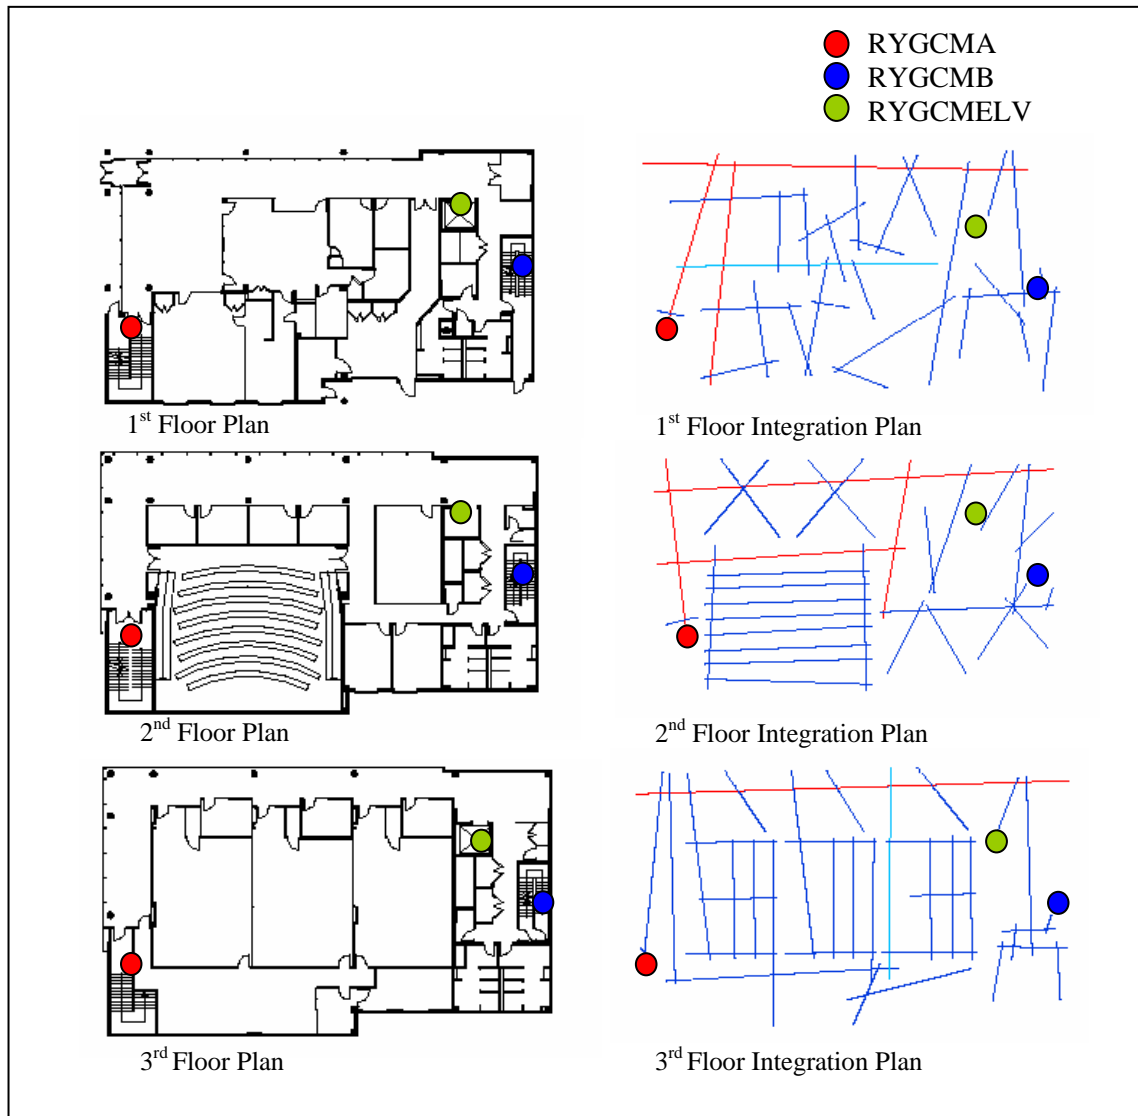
Floor Plans and Integration Plans for Building RYGCM indicating Location of Stairs and Elevators
